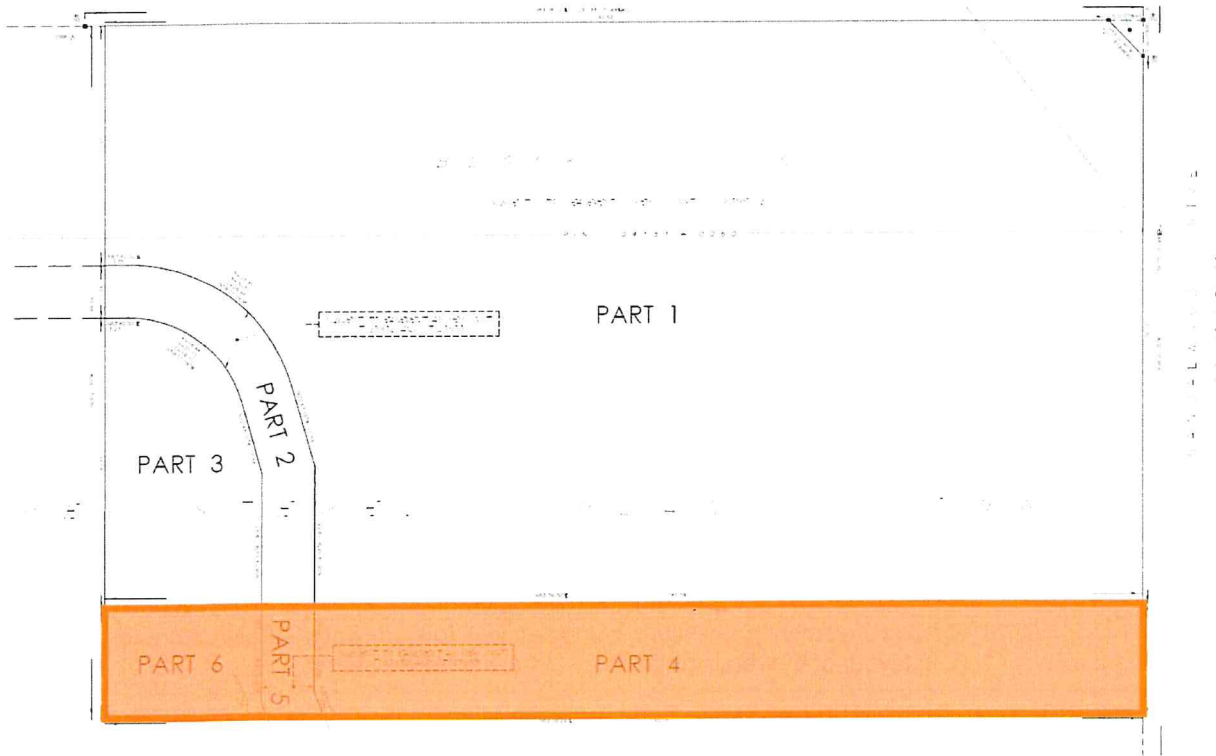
Approved easement (orange) shown on top of the R-Plan.
